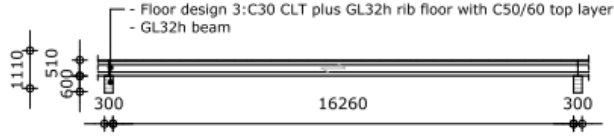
Cross-section C-C glulam beam in mm minimum height
